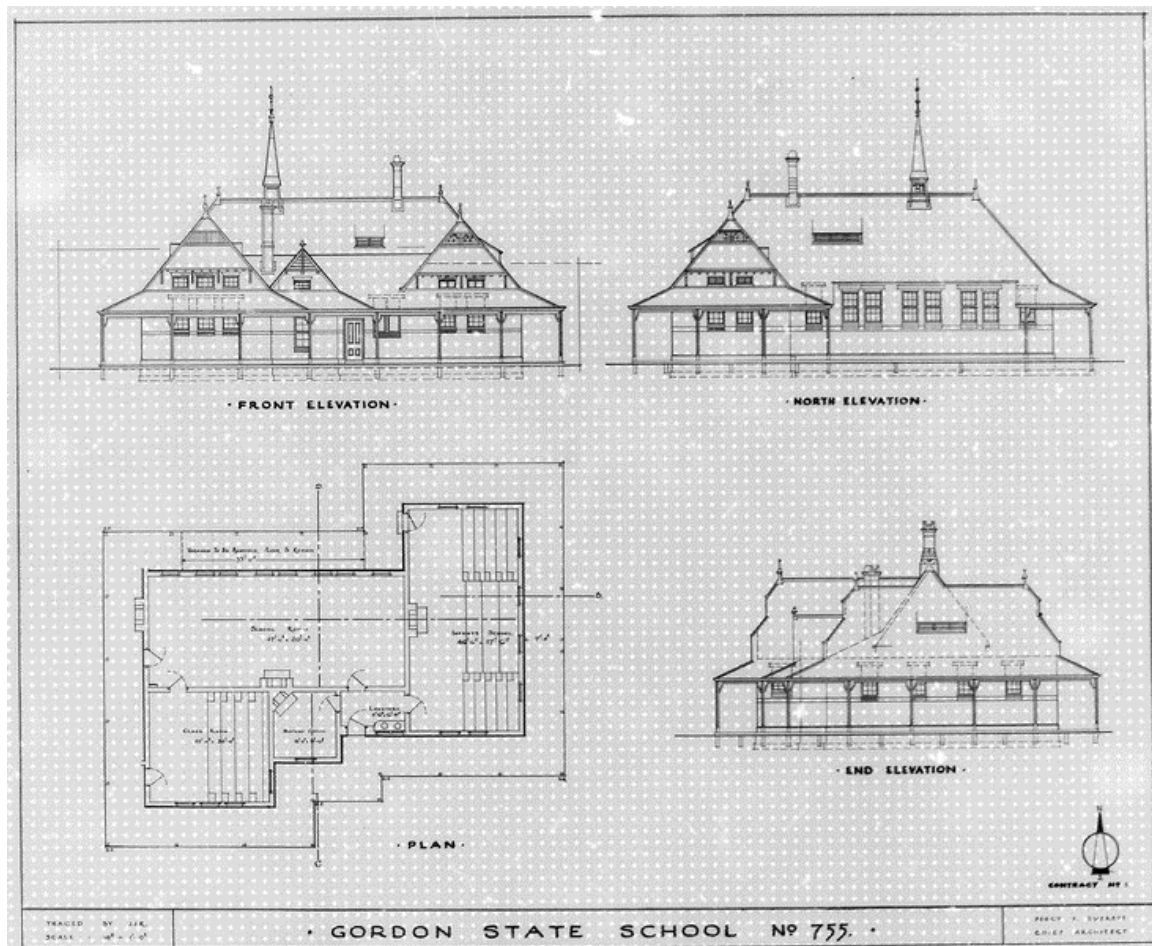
P. Everett, Verandah alteration to Gordon State School No. 755, floor plan & elevations, 1934.
